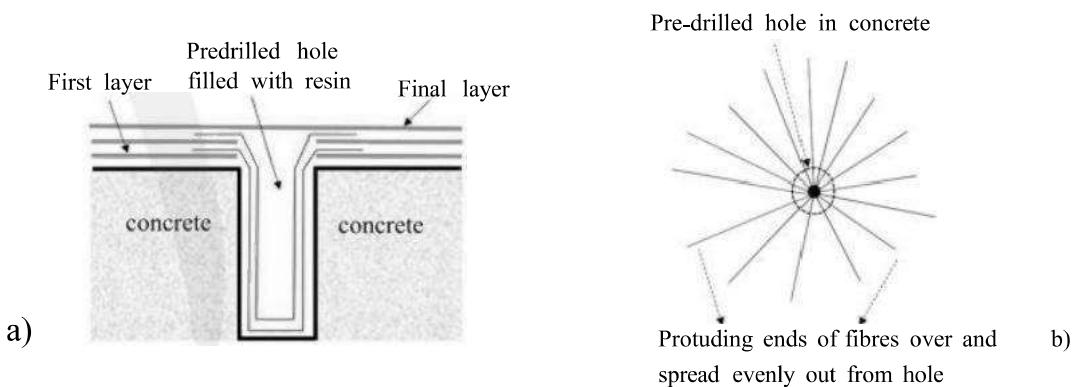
Fibre fan anchor system(spike anchor):(a)cross section,(b)top view
